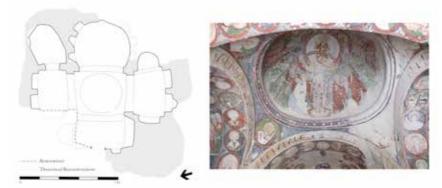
El Nazar Kilise, Göreme, floor plan and central dome. Plan and photo credit: E. Zanghi.
